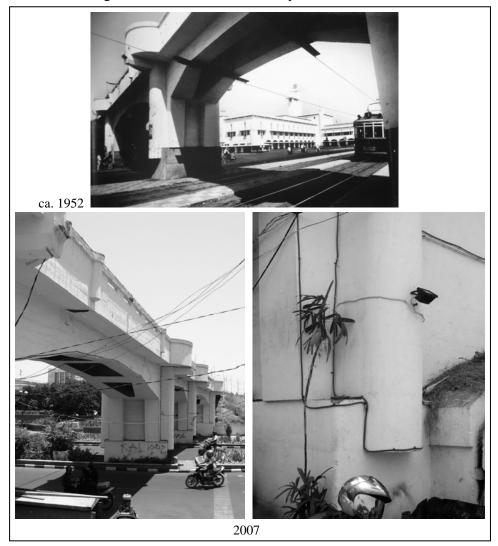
Pasar Besar Railway Viaduct: pillar.
